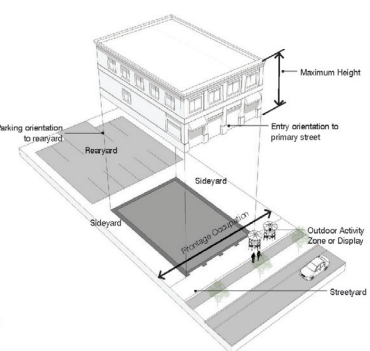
BUILDING AND SITE TYPES
